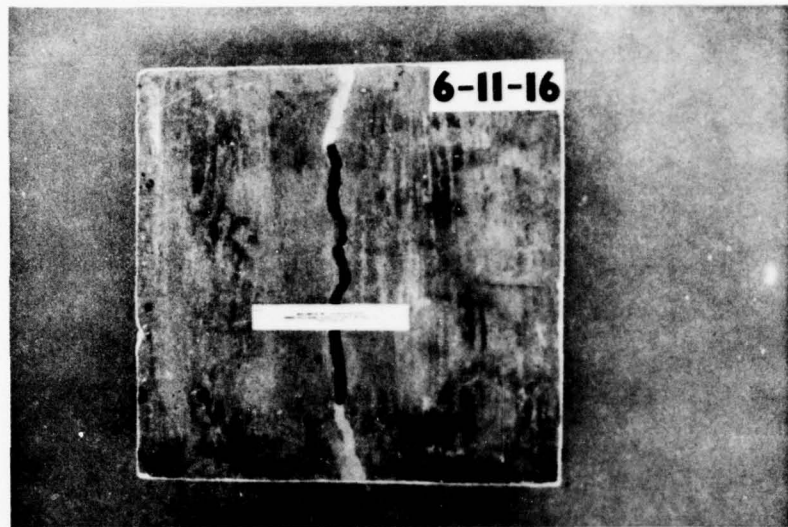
Grouted concrete slab with 3/8-in. (9.53-mm) crack.
